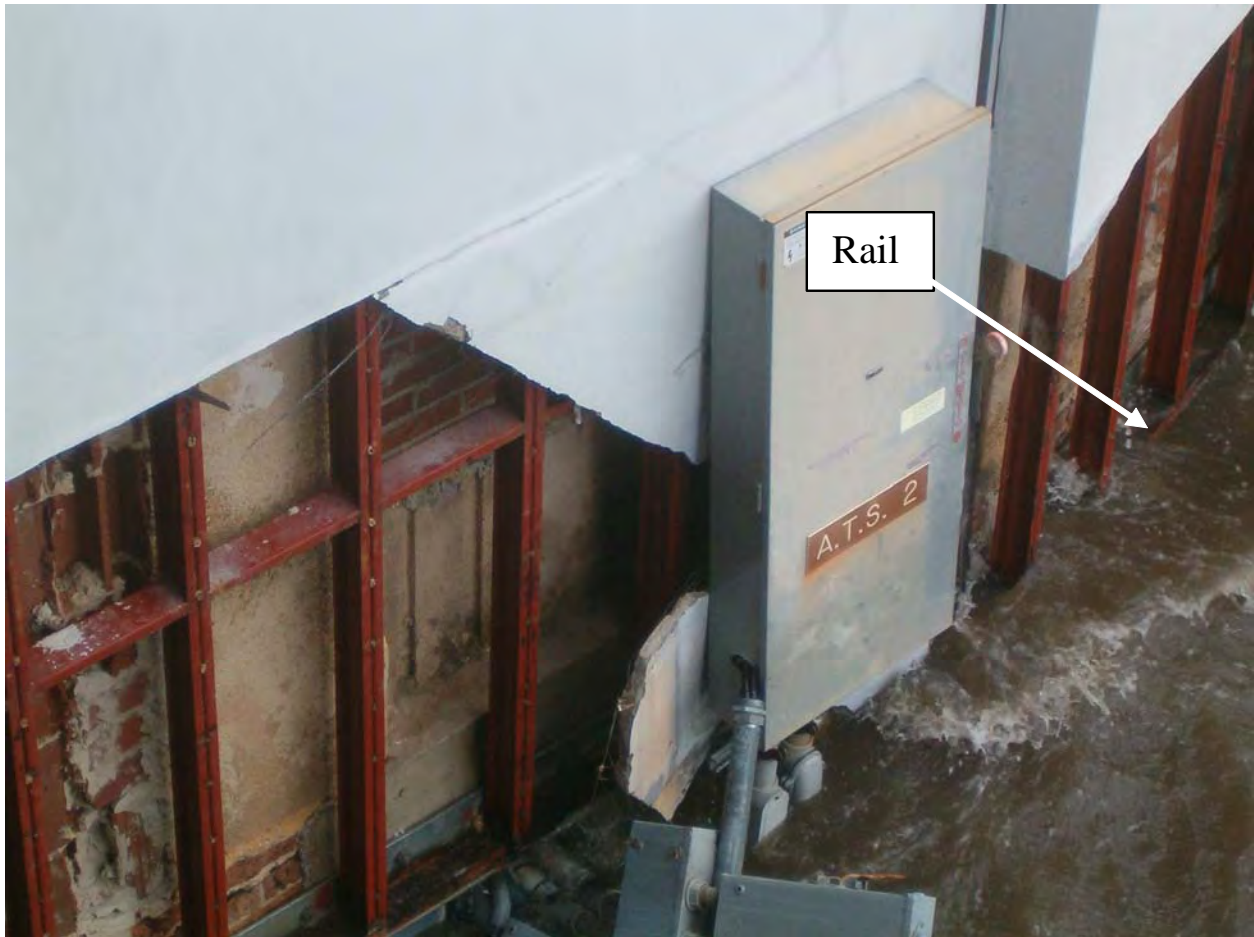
Time = 5:30 PM, APH-11. Bottom of horizontal rail to right of electrical panel box on north side of terminal building, east of lobby.
